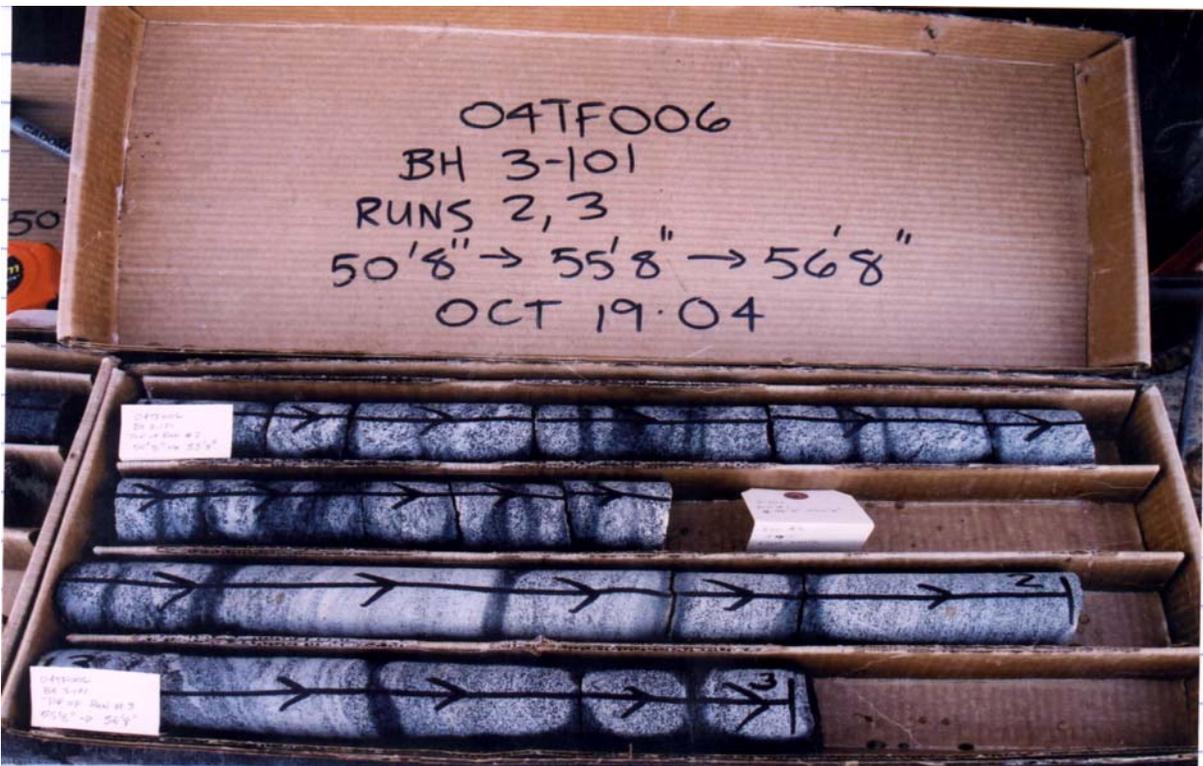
Biotite Gneiss Borehole 3-101, Rock Cores 13 and 14 at west abutment (South Mary Lake Road)
